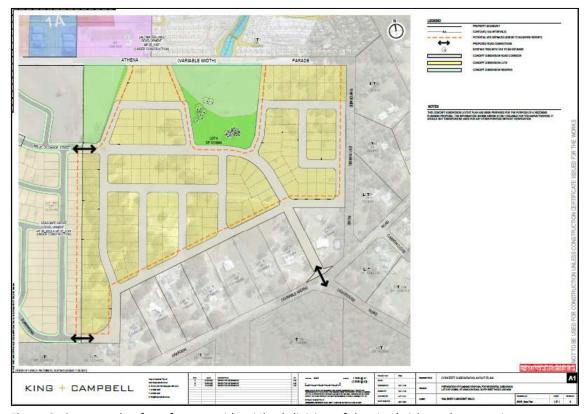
Concept plan for a future residential subdivision of the site (with road connections identified)
